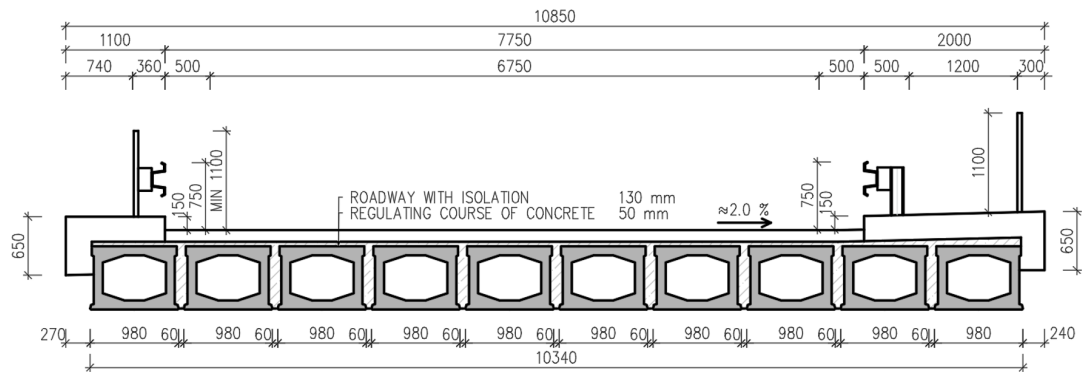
Cross-section of the bridge, dimensions in mm.
